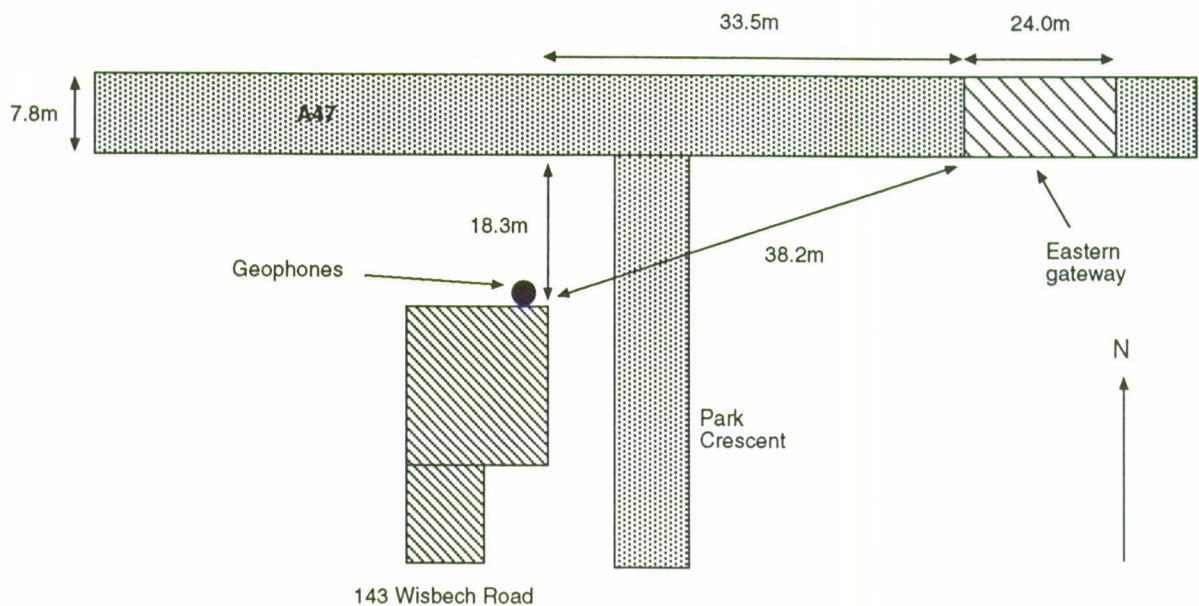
Site plan of ground-borne vibration measurements at 143 Wisbech Road
